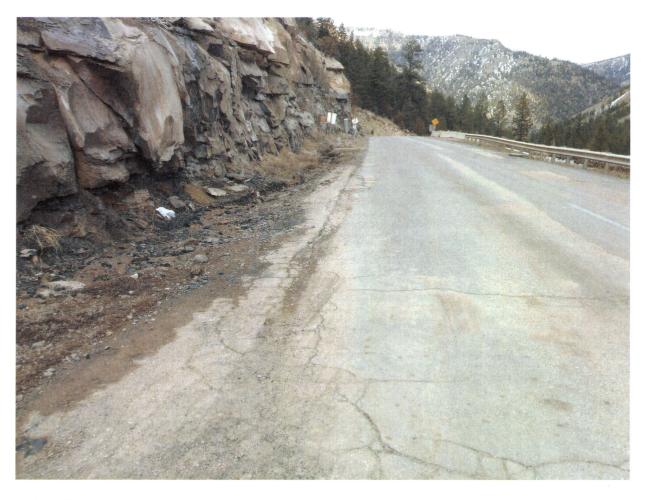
Water flowed on the ditch on the side of the road to about the first white sign on the left, then went under the road through a pipe to pond 001 where none was discharged to Crandell Creek.
